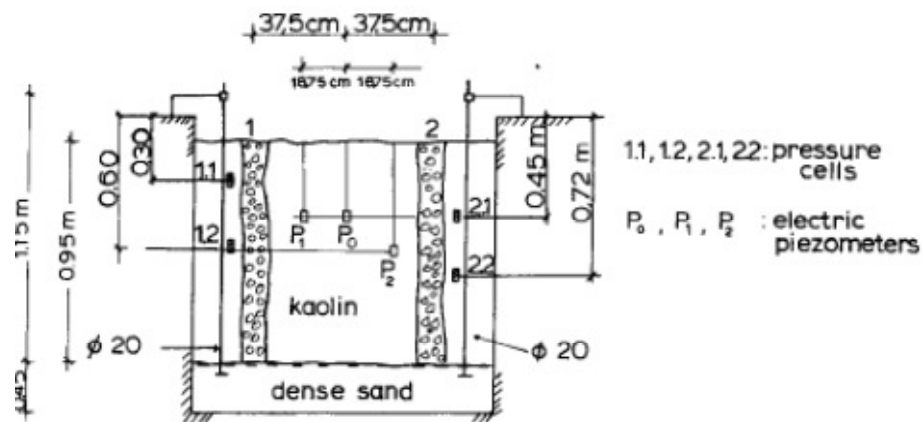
Cross section of two model stone columns and instrumentation layout (Christoulas, 2000)
